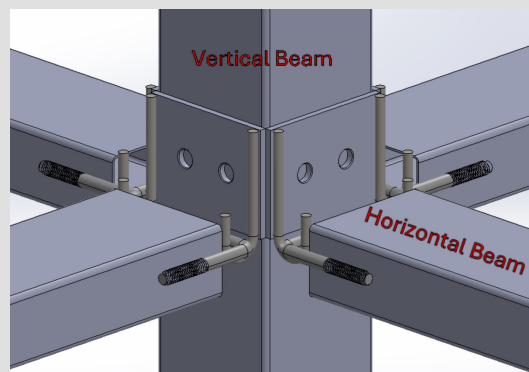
Center beam with sheet metal and hook connection. The horizontal beam has a slot in connection with its welded U-bolt dropping onto the J-hooks.
